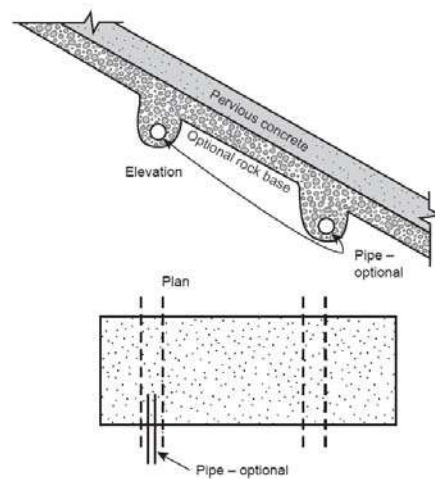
Structural Plan and Elevation of a Sloped Pervious Concrete Pavement Design
